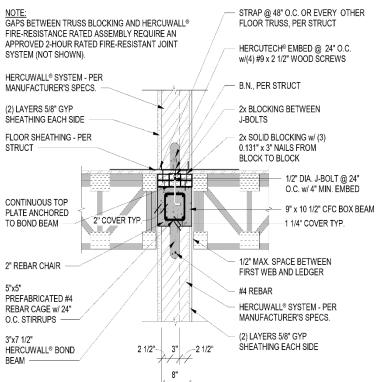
2-hr Load-Bearing Braced (2 Sides) CFC Box Beam Wall¹
